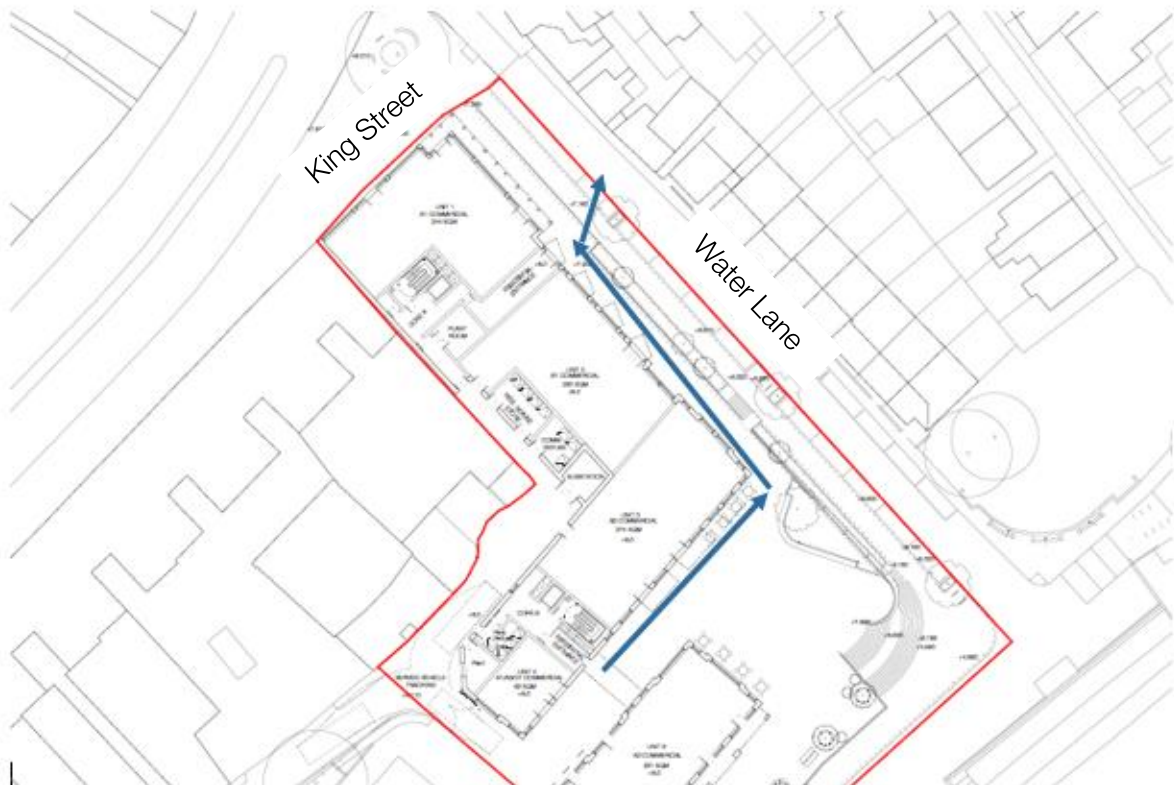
Route from the ground floor to the Junction of Water Lane and Kind Street
